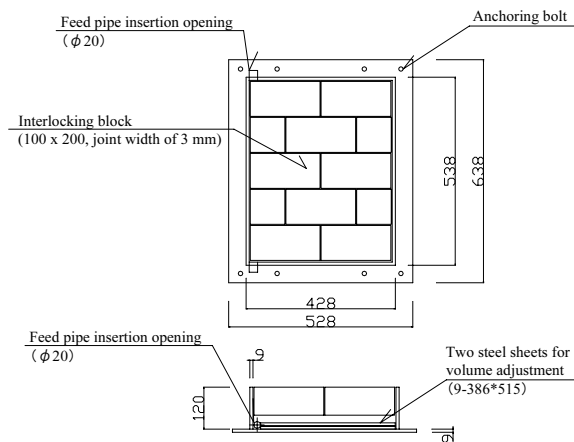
Detailed drawing of specimen for dynamic wheel loading test
